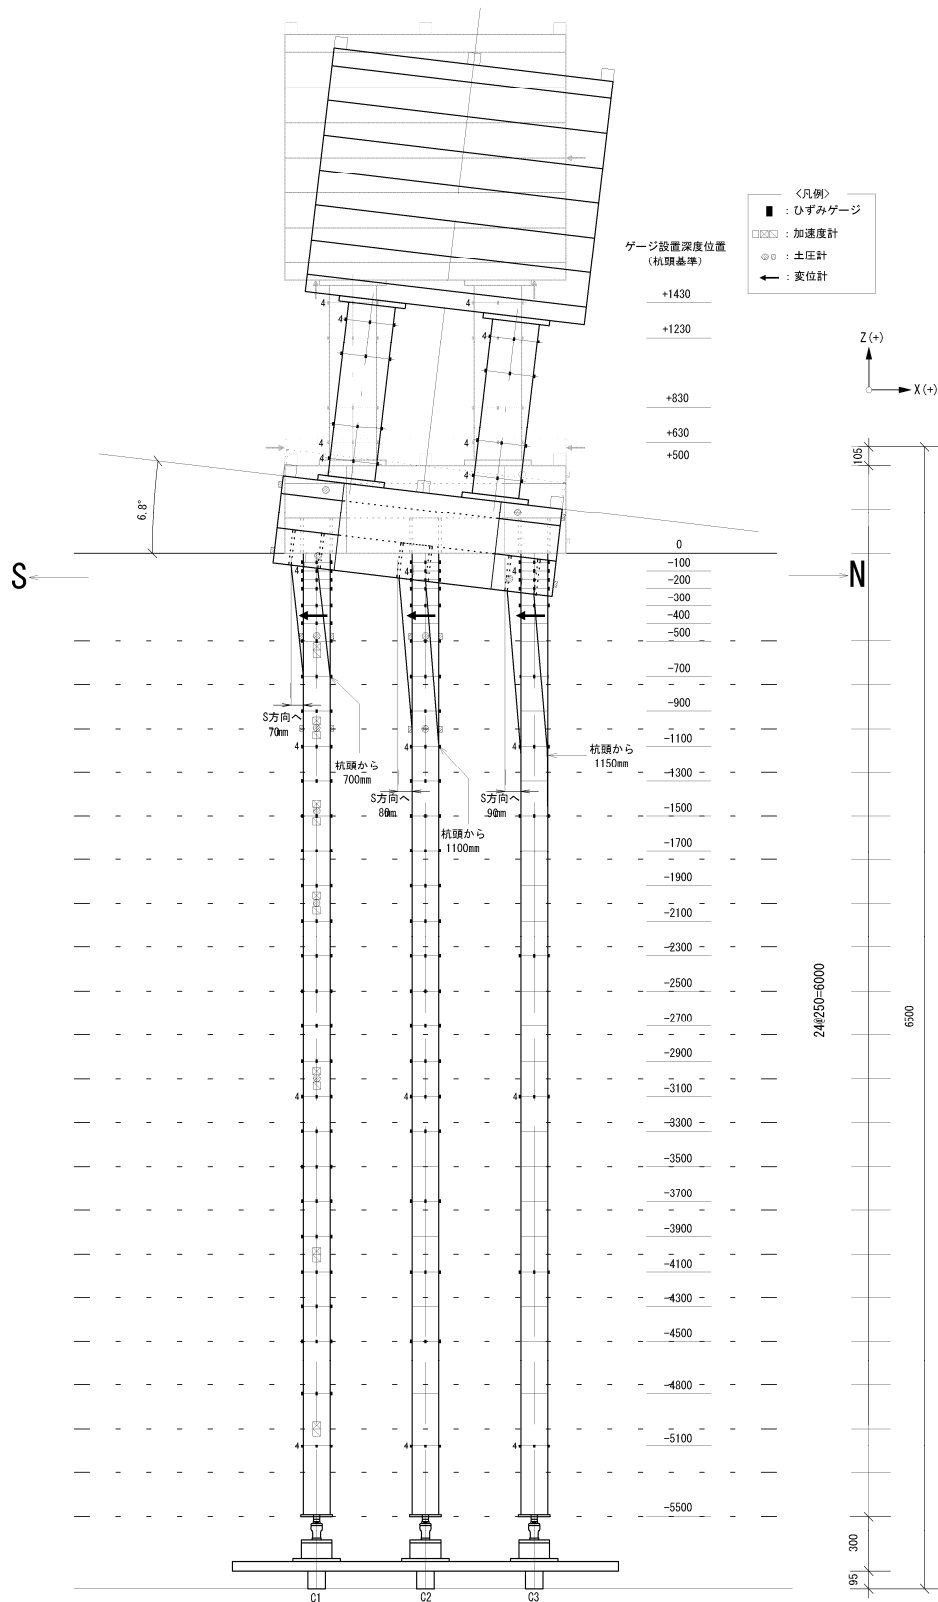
Piles after the test: Piles C1, C2 and C3 in north-south section.
